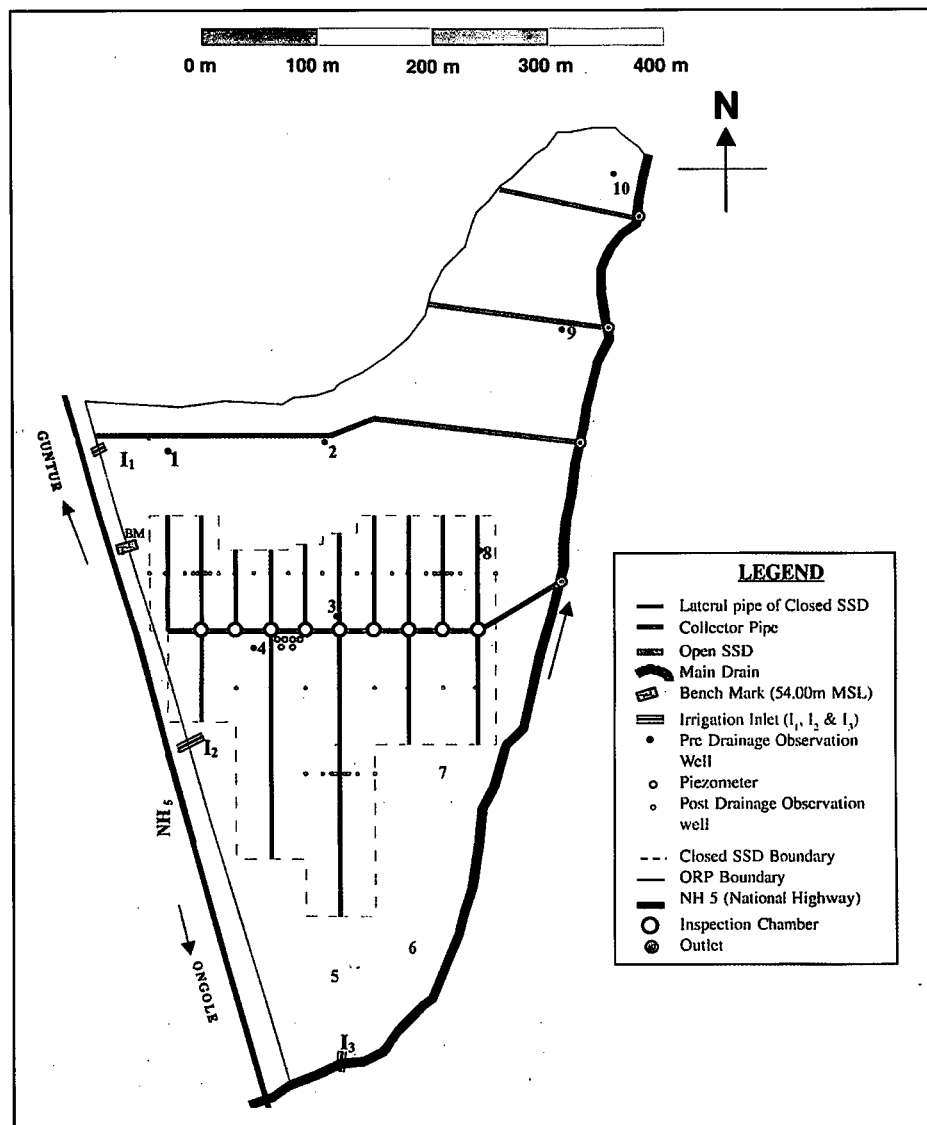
Layout of the subsurface drainage system in Konanki pilot area
